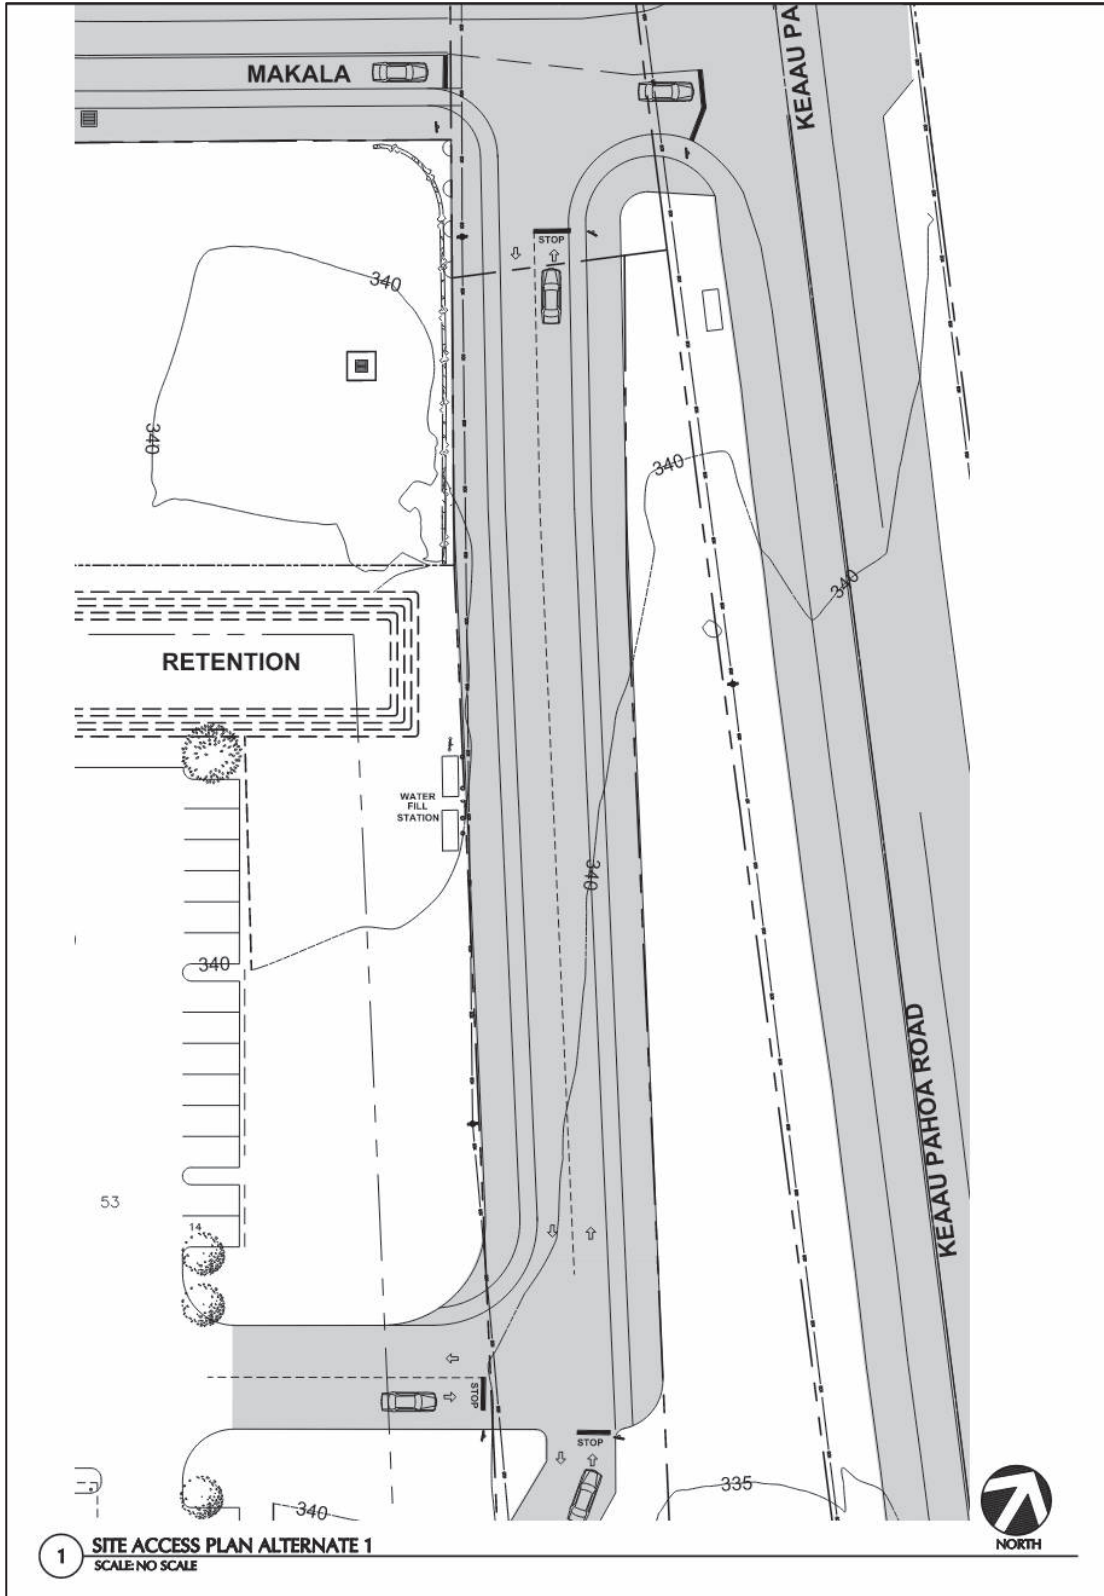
Alternative 1 Driveway Alignment with Connection to Frontage Road
